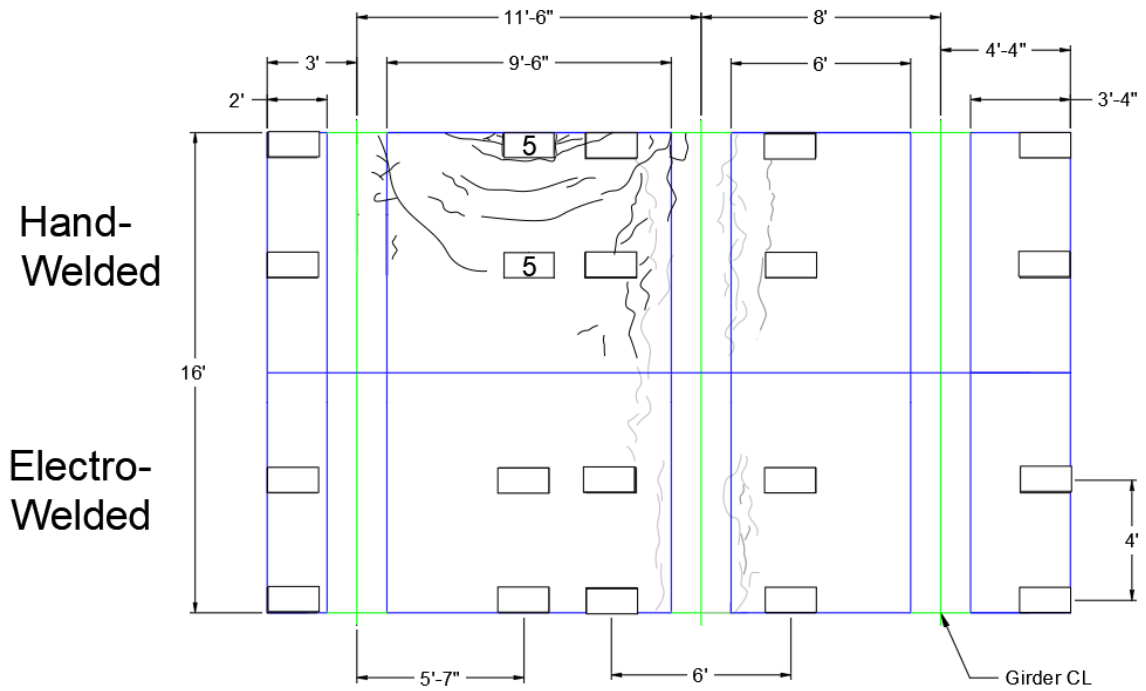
Crack Map - Test 5, Hand-Welded - Positive Moment over Long Span
